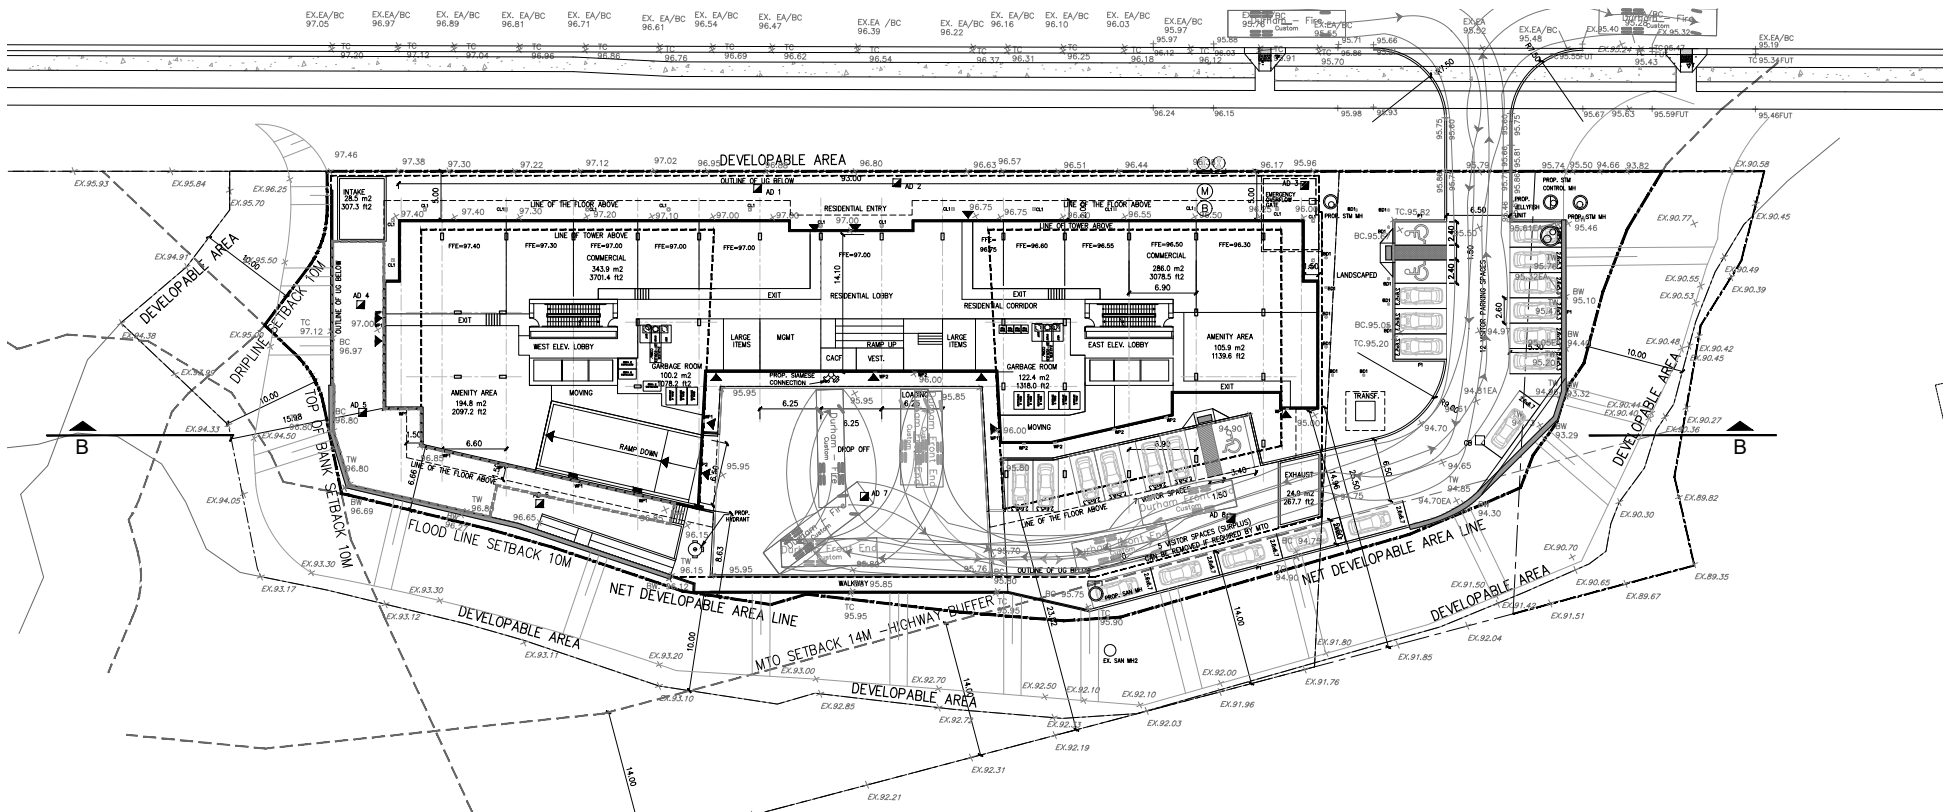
GROUND FLOOR PLAN (ICON ARCHITECTS)
